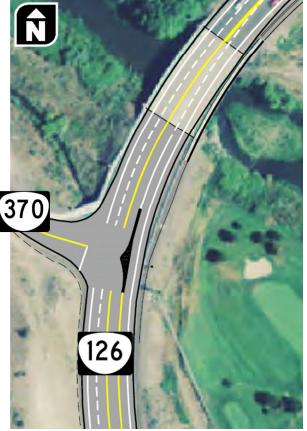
OR 126 Corridor Plan interim improvement concept.
